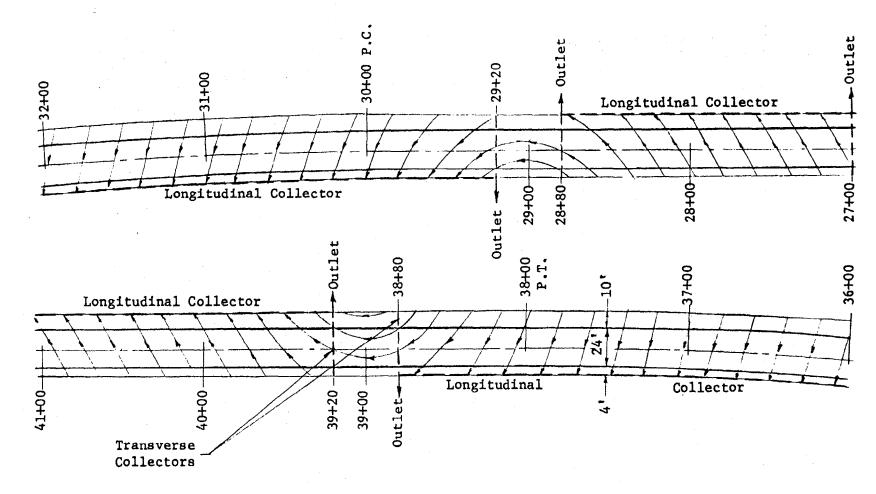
Layout of Proposed Drainage System Showing Direction of Flow in Drainage Layer - Details and Dimensions for Example 16.
